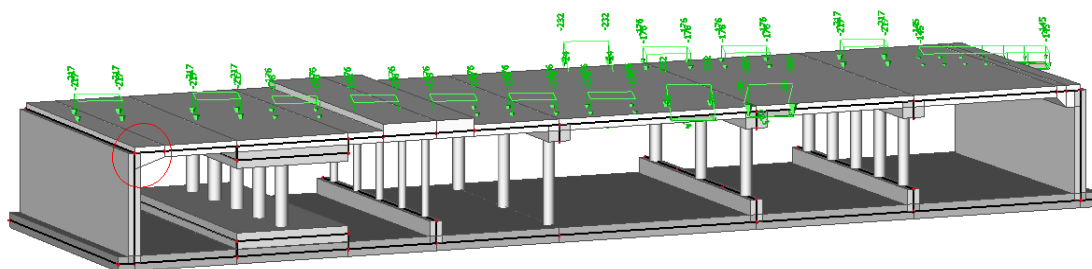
Segment Q8, finite element model with load P1 and cross-section roof
